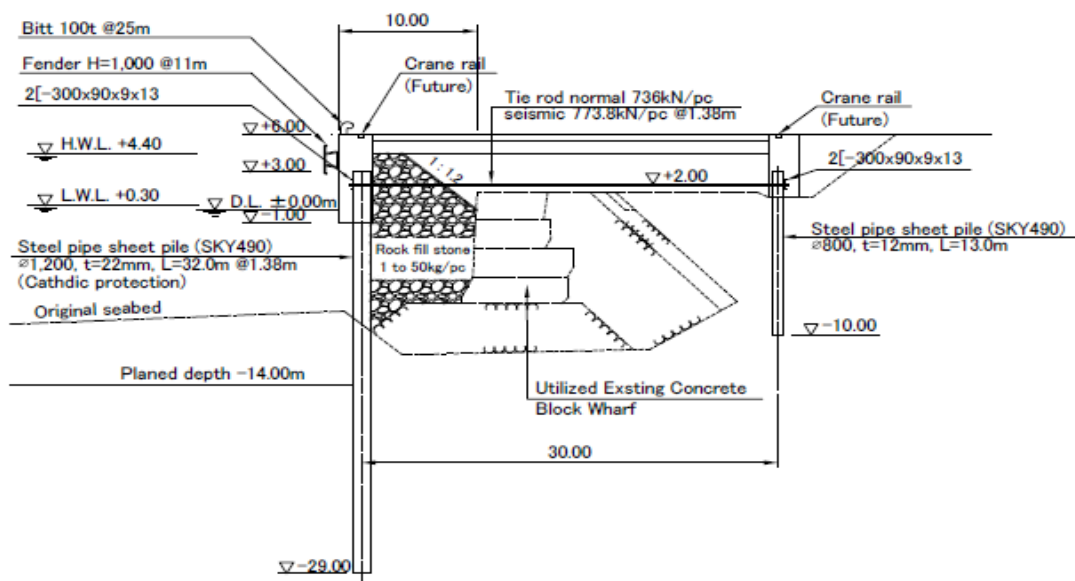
Steel pipe sheet pile at north side (10m widening)
